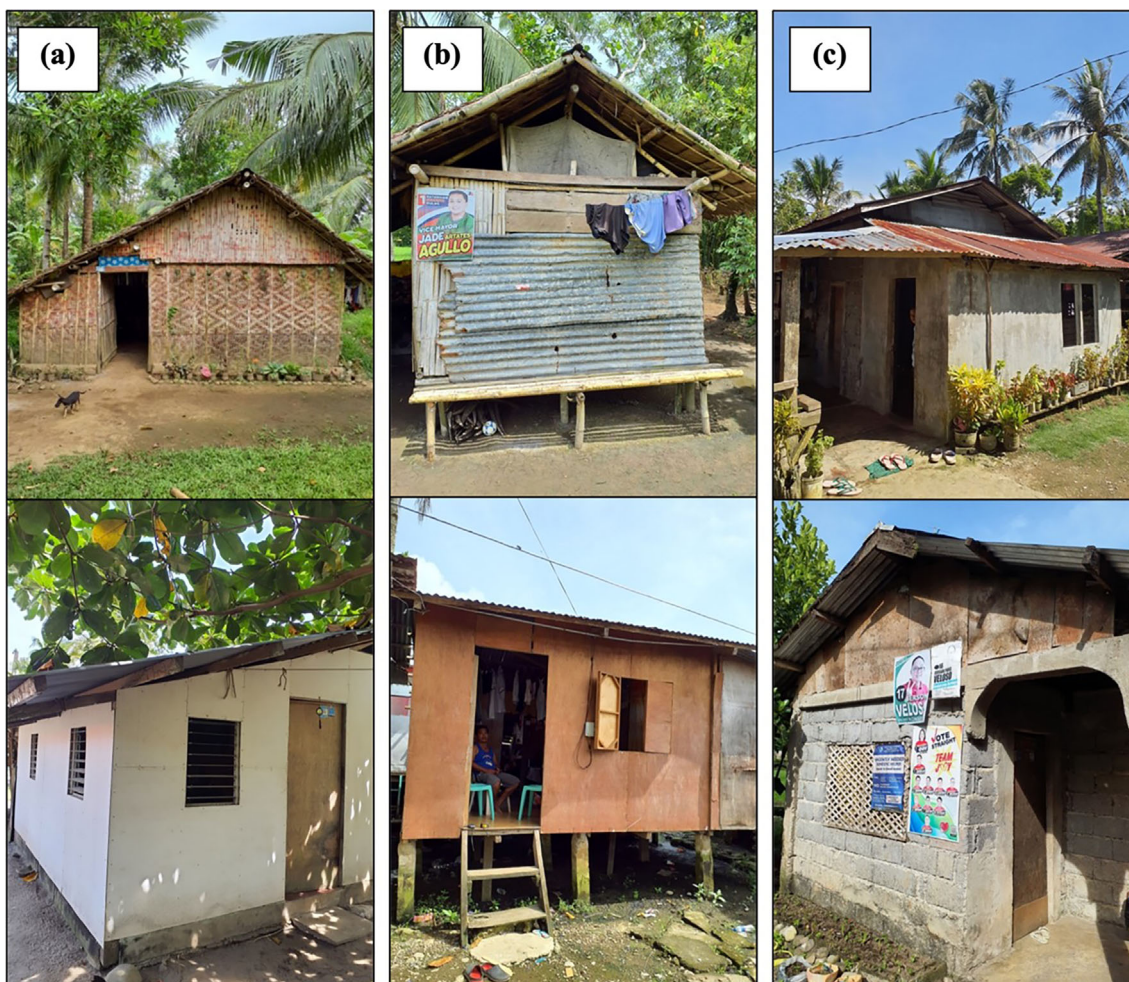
Building typologies: (a) light material (LM), (b) light material elevated (LM-E) and (c) masonry material (concrete hollow block).
